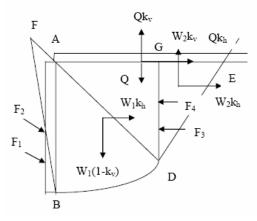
Failure surface and forces considered for positive wall friction case (Choudhury, 2003)
